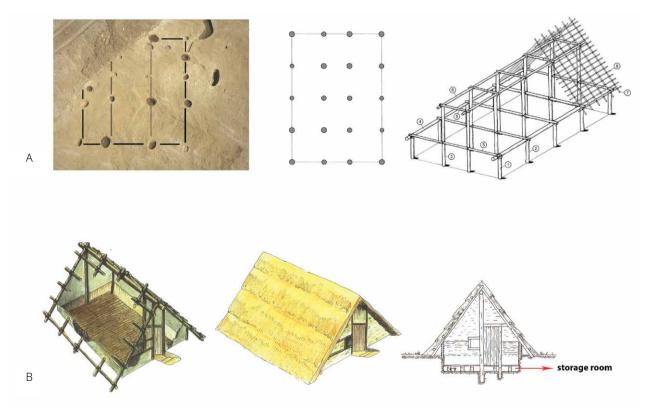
a) Post-built structure from the Virovitica-Kiškorija north site (after Dizdar 2006), and reconstruction (Dular 2008); b) Semi-sunken structure and its reconstruction from the Josipovac-Selište site (after Filipec *et al.* 2009).
